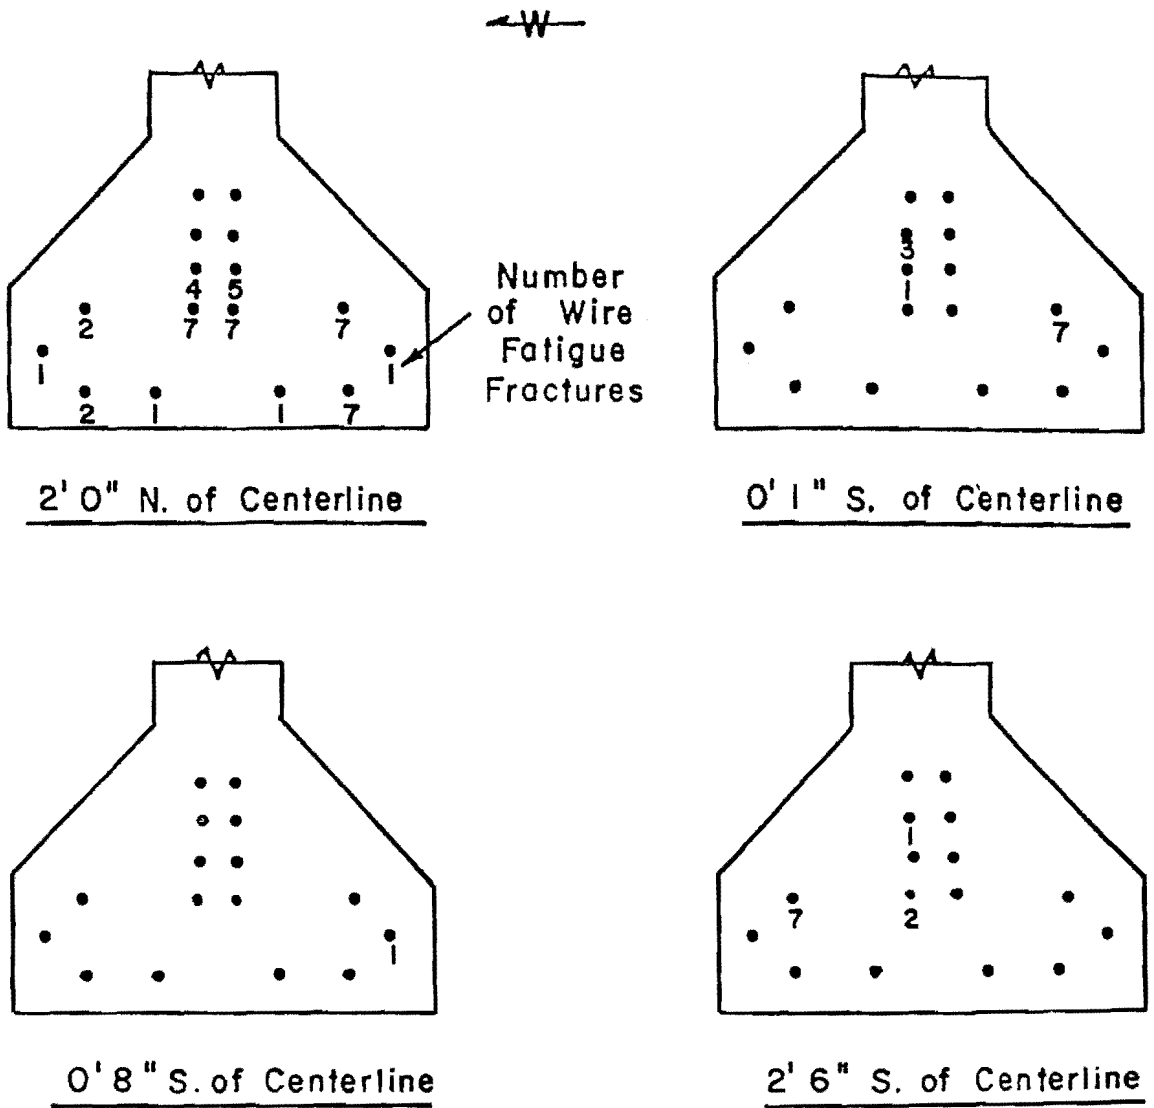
Fatigue fracture locations for Specimen C-16-NP-10.1-NO-0.91 (continued)
